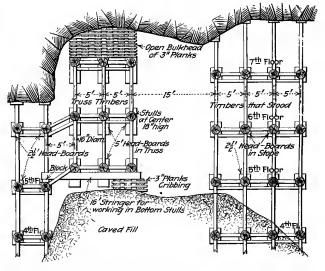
AT THE TOP OF THE CAVED FILL THE TRUSSWORK OF SPLICED STULLS IS SUPPORTED ON CRIBBED PLANK, WHICH ALSO CATCH UP THE BACK ALONG THE TRUSS RIDGE
